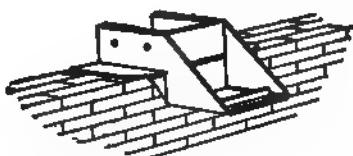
Duplex Wall-Hanger for Large Timbers.
